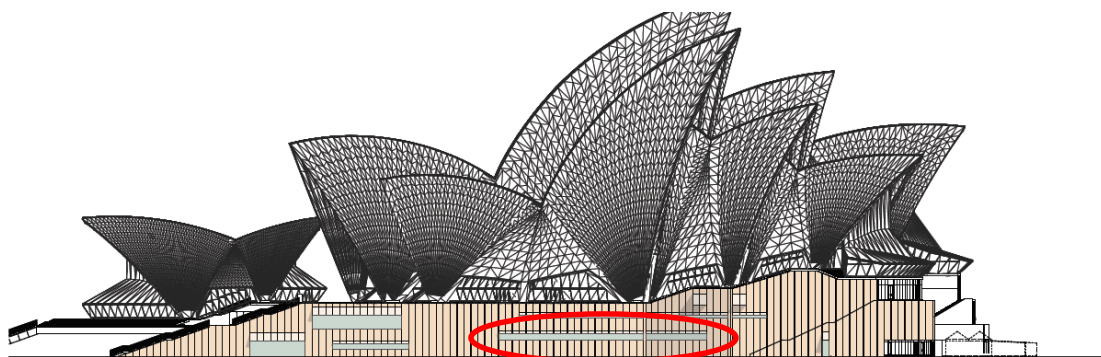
Proposed new slot window along Eastern Façade [Source: Sydney Opera House / TZG Architects]
